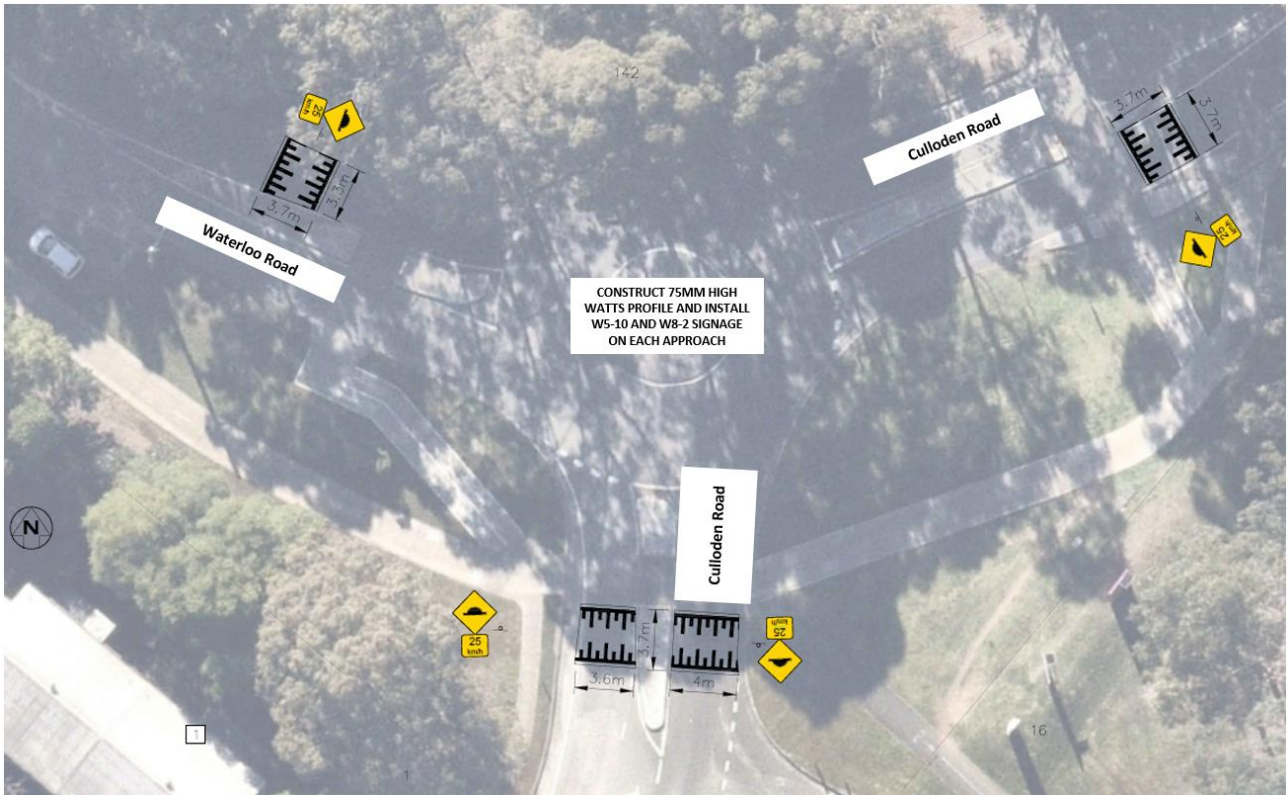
Location of proposed speed humps at the intersection of Culloden Road and Waterloo Road
